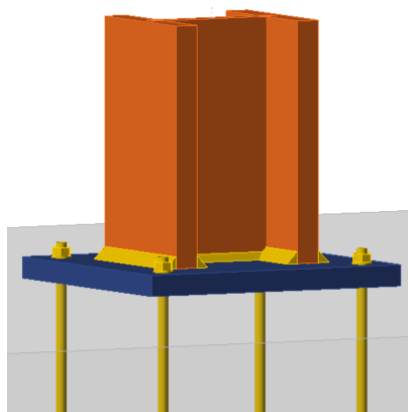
Connection of the main column and the end plate with anchors on top of the concrete footing (own illustration, made with IDEA StatiCa)
